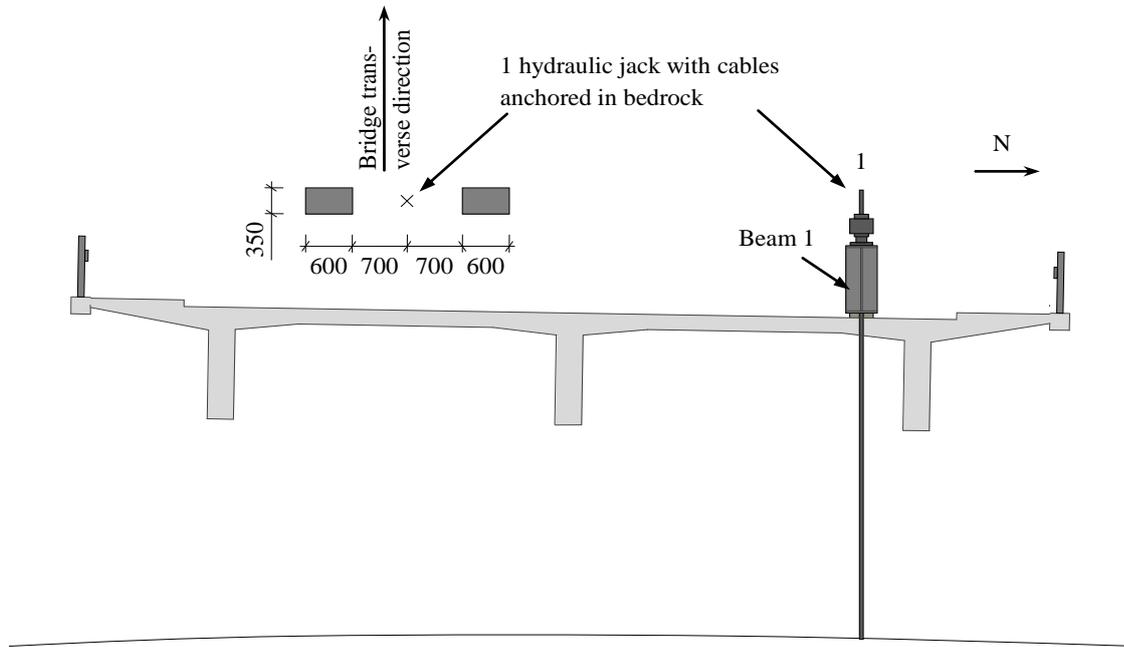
Arrangement for loading the bridge slab in span 2-3.
